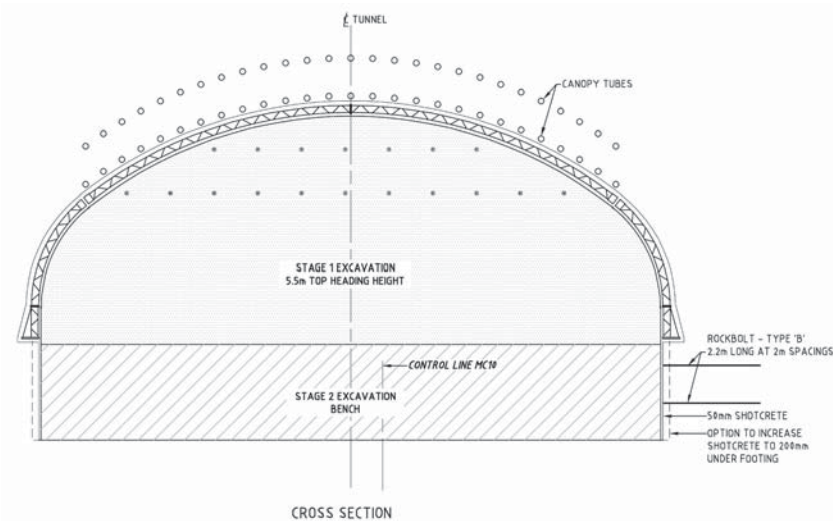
Cross section through the tunnel showing 27 canopy tubes over the tunnel arch.
